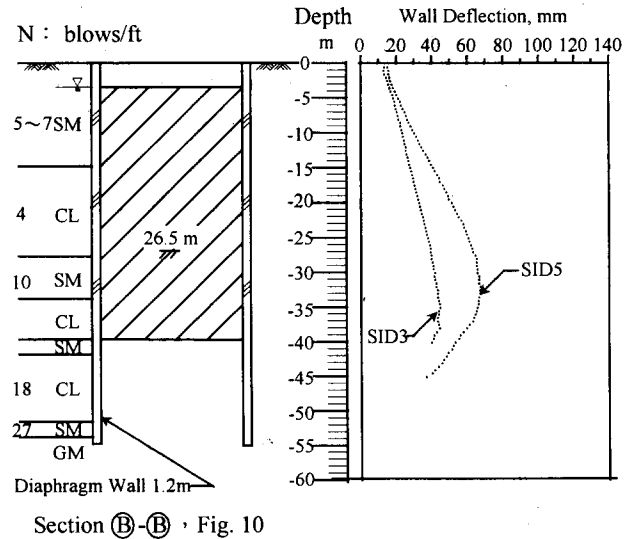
Wall Deflections - Job 1 With Cross Panels
